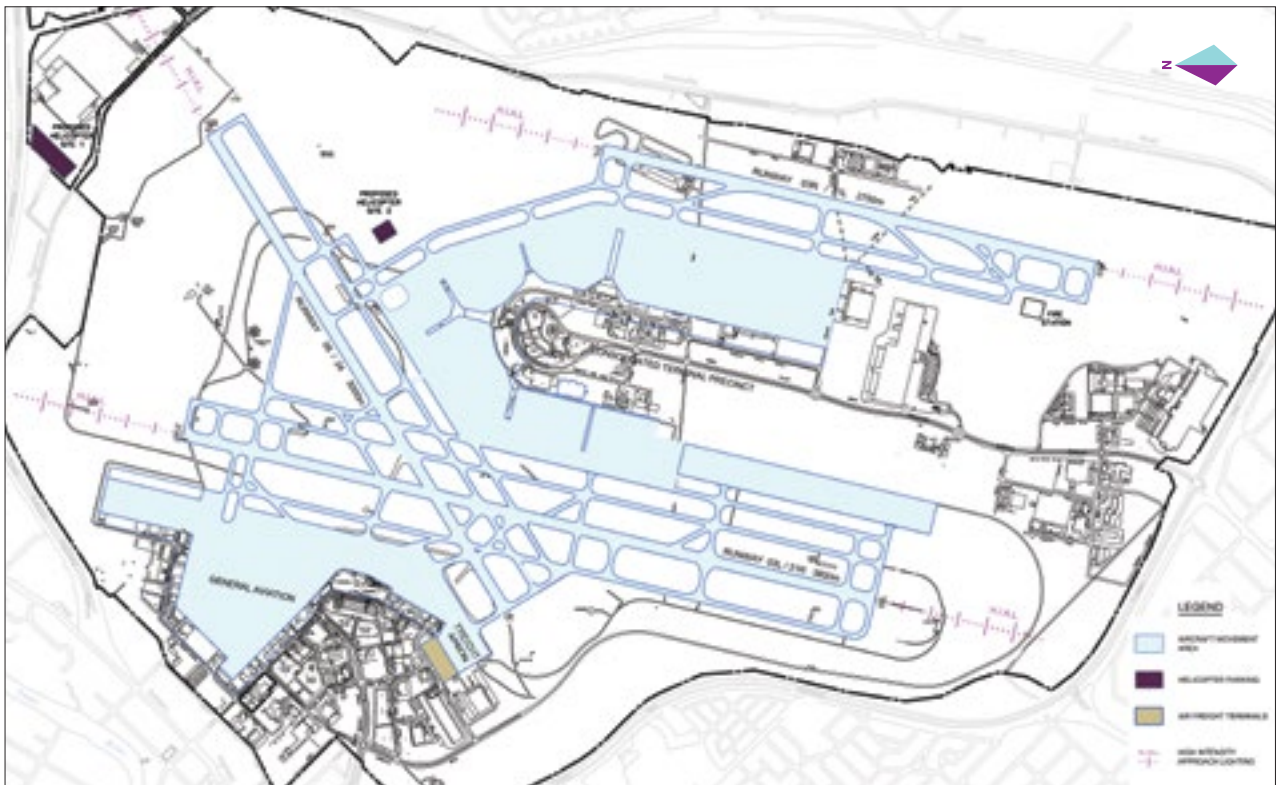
Perth Airport Airfield Layout Master Plan 2009
